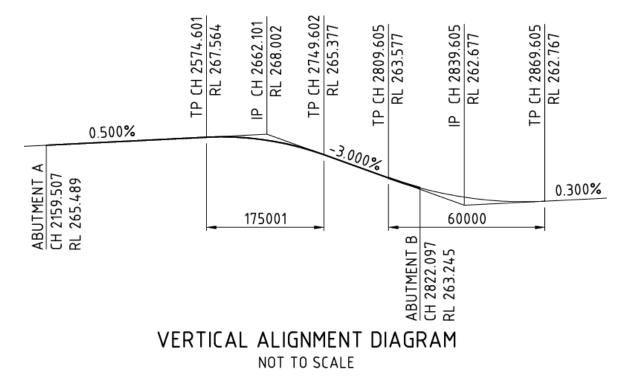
Modified vertical alignment of New Dubbo Bridge
